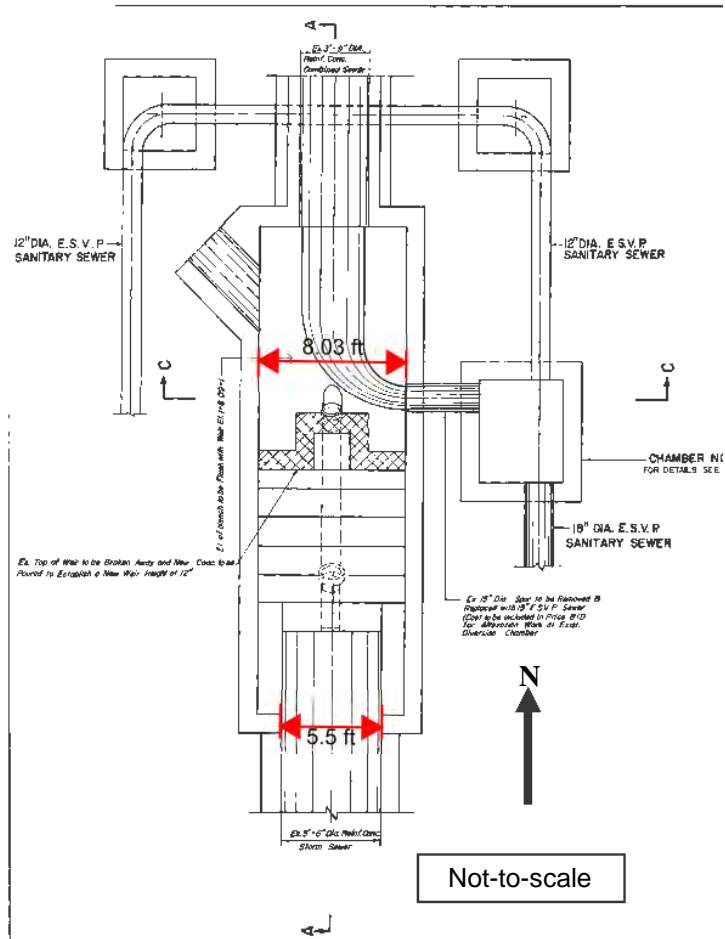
Plan View of Regulator NCQ-2 (Outfall NC-029)
